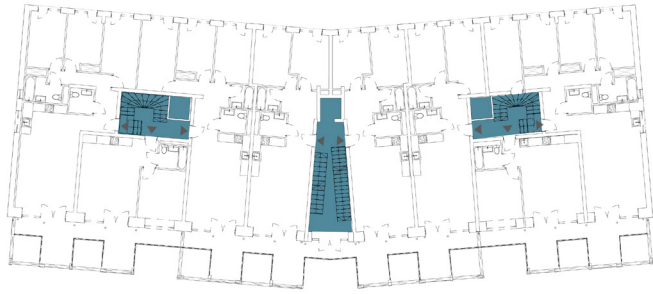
Horizontal Access, Typical Floor - Soubeyran / Geneva
